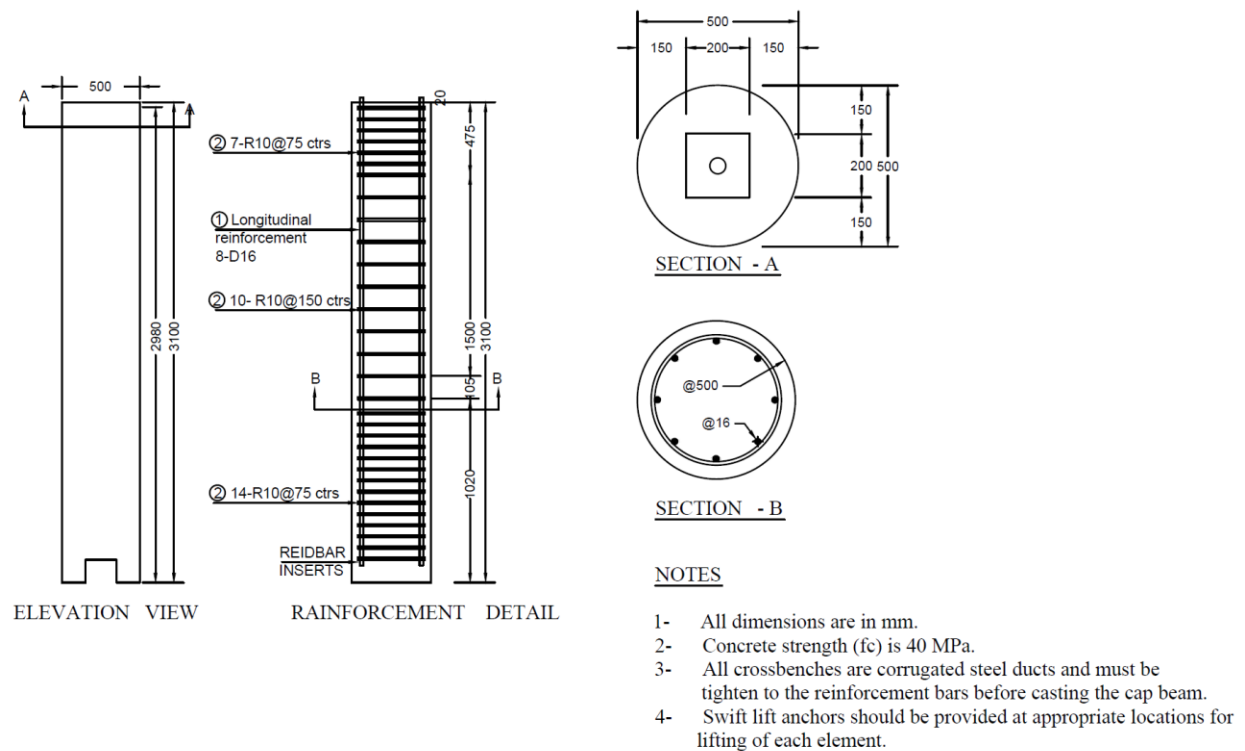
ECIP bridge pier geometry and reinforcement arrangement
